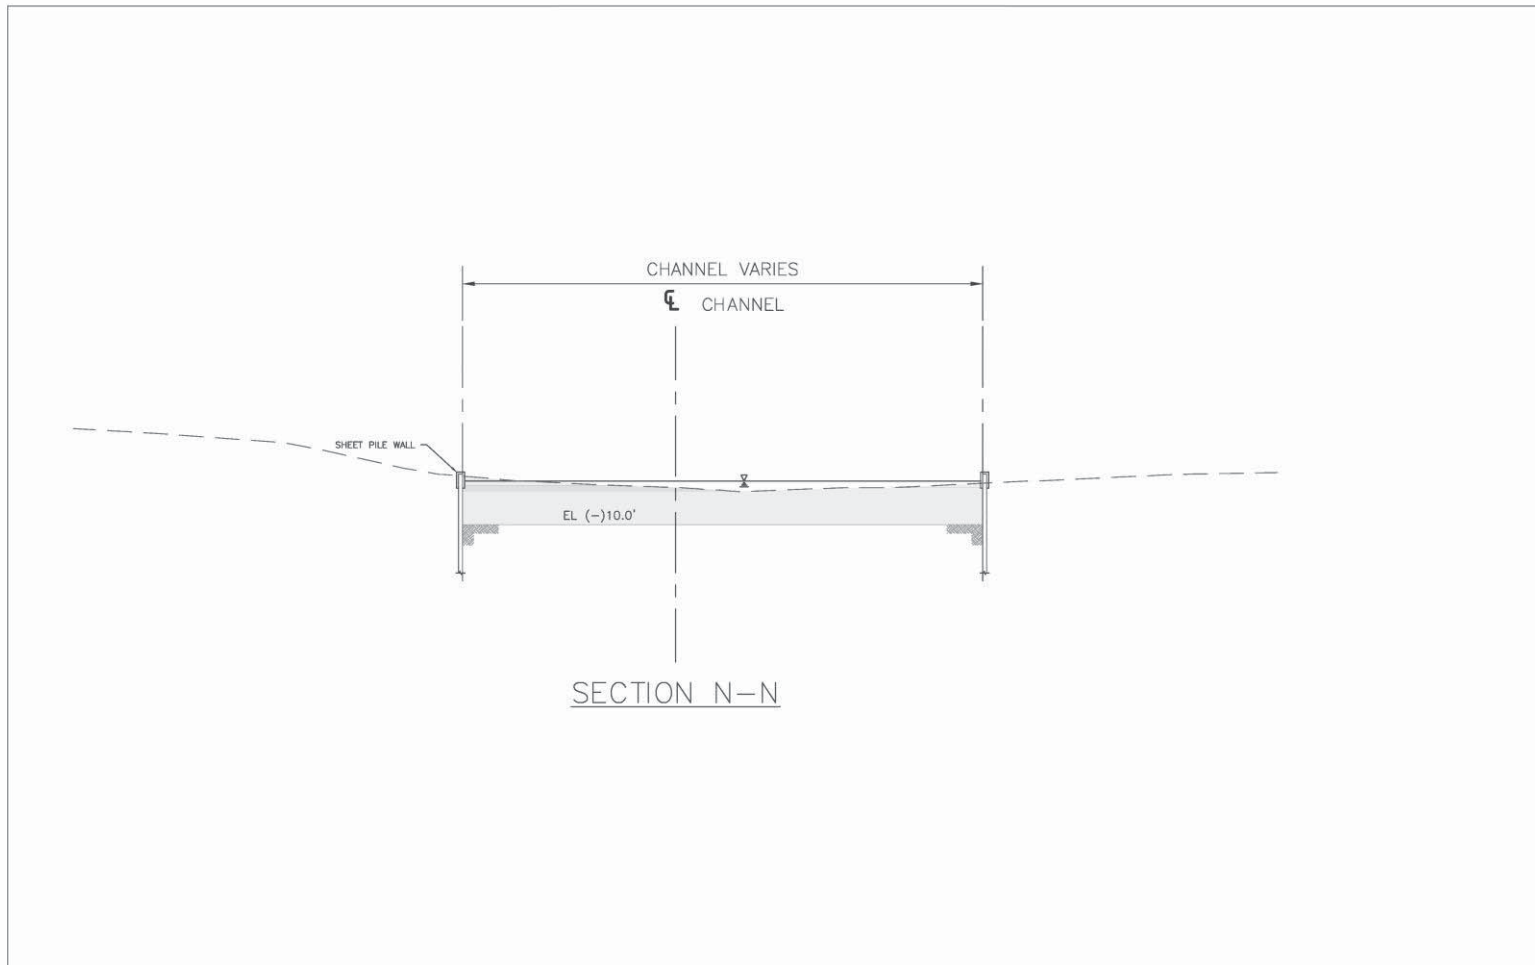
Cross Section N-N, Dr. Barbosa Avenue Bridge
